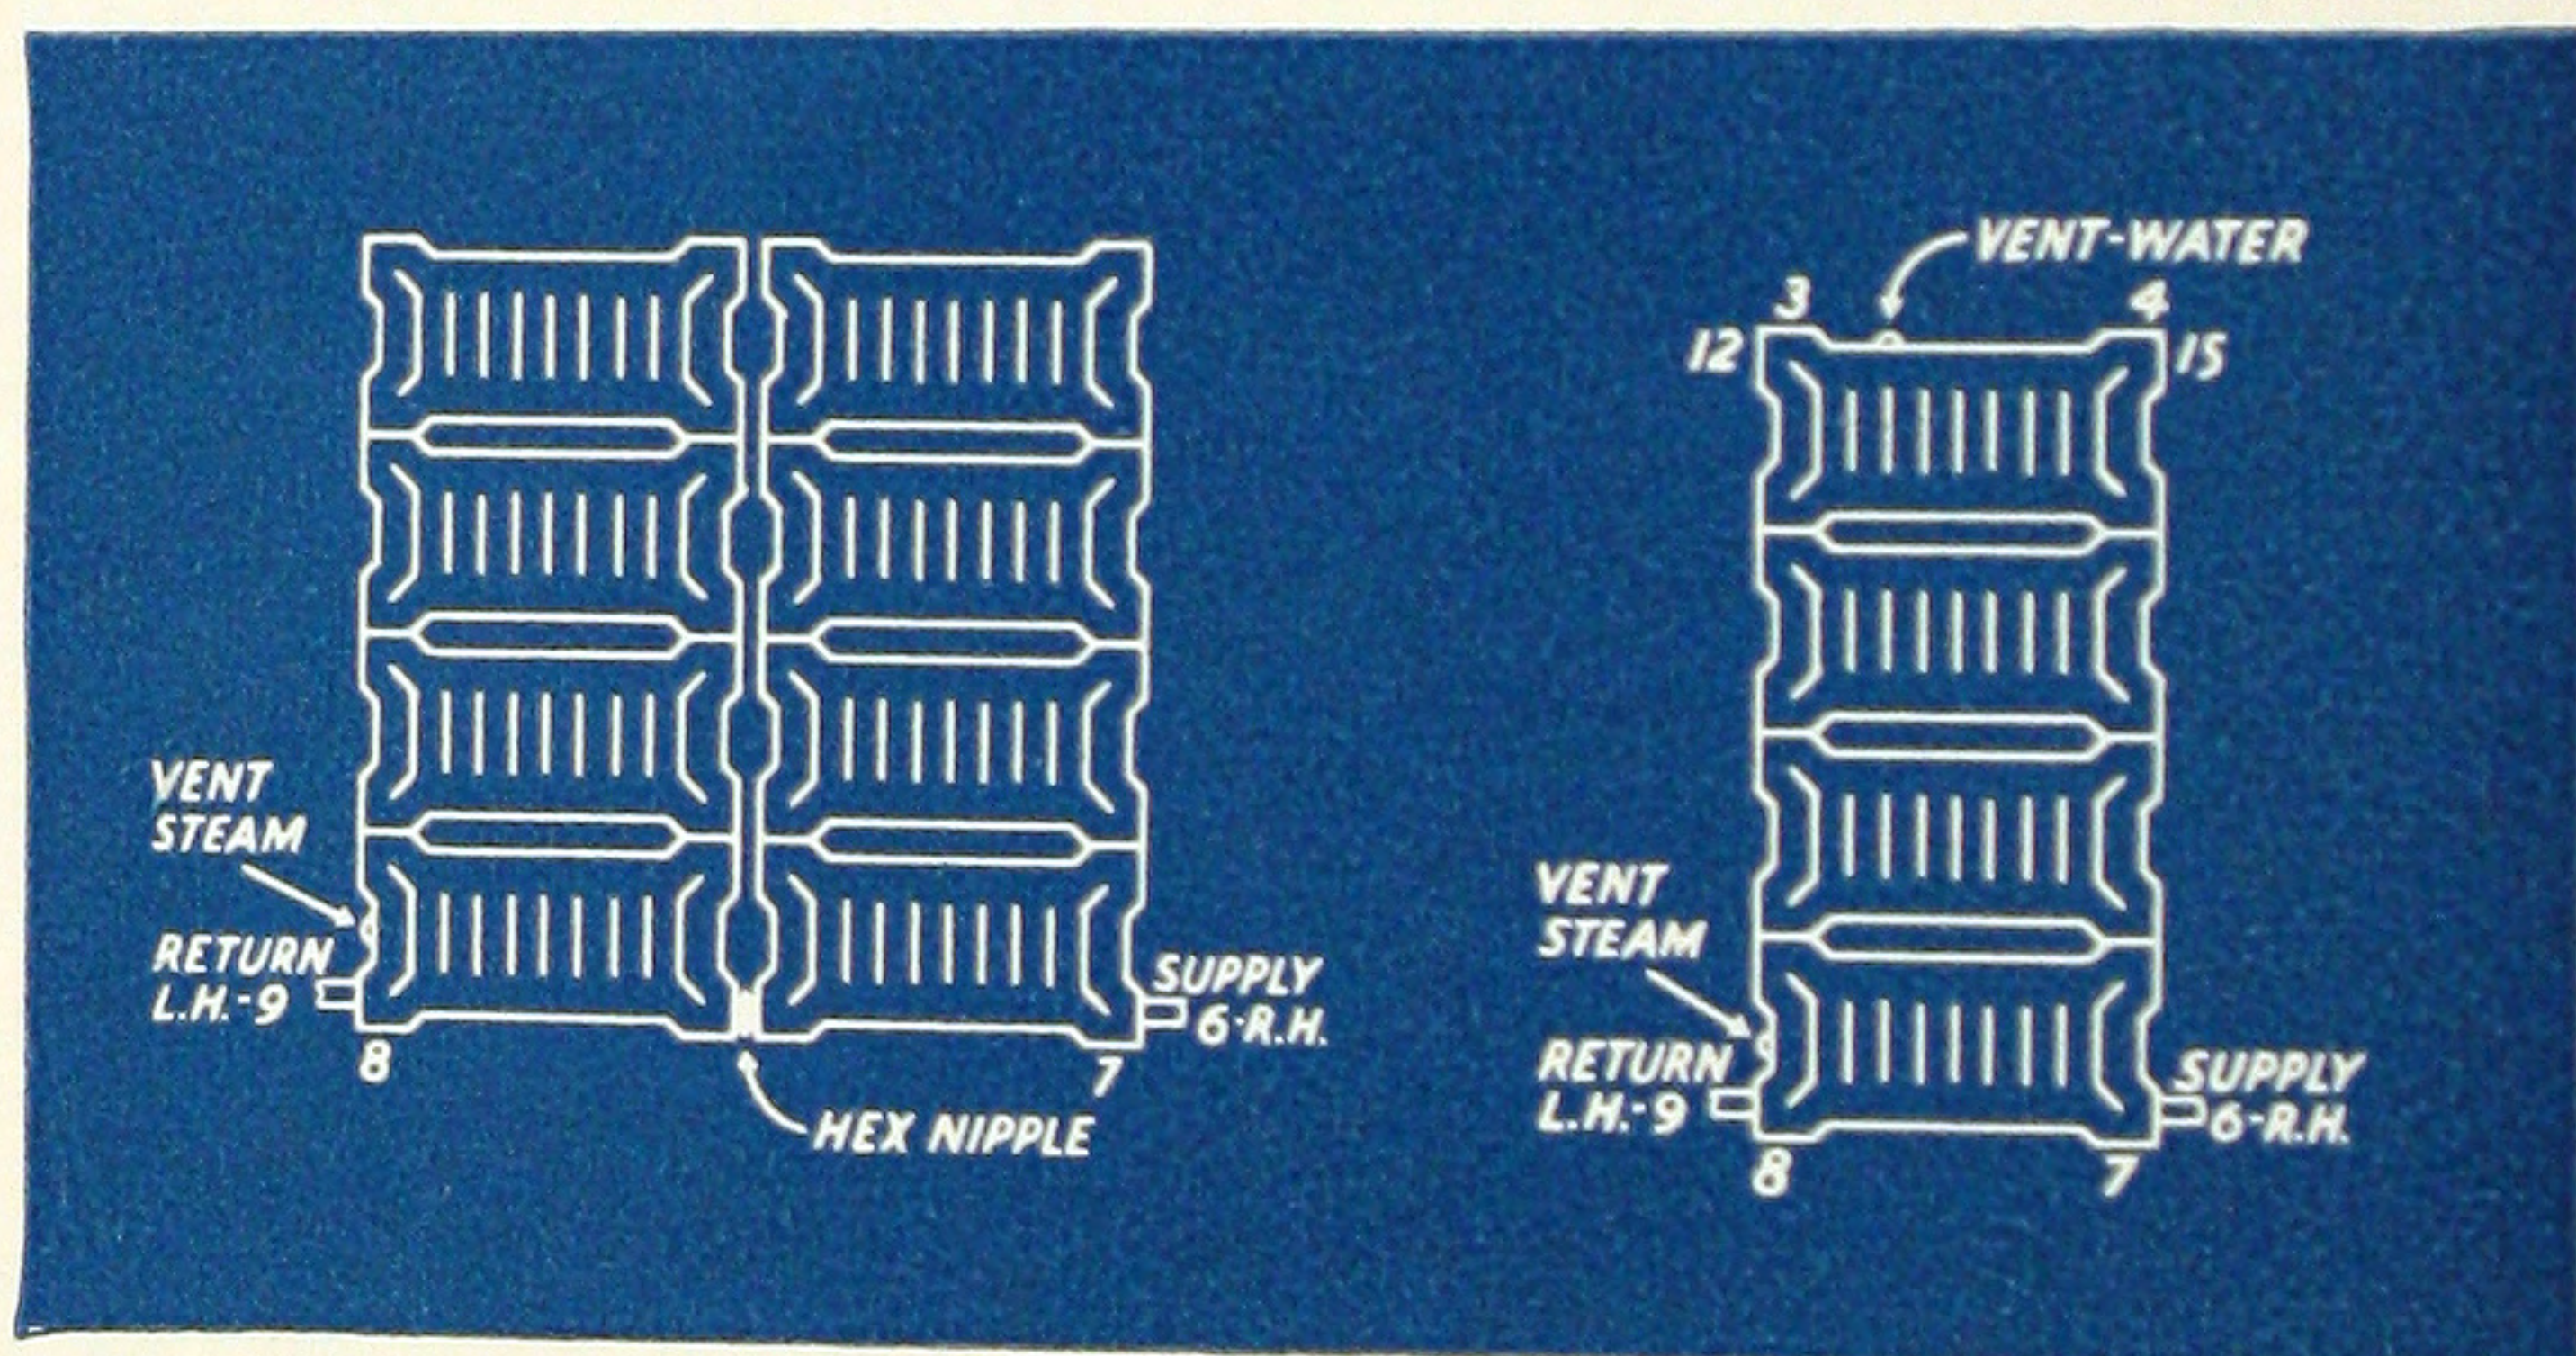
Assembled in two or more stacks. One and two pipe steam only. Bottom feed.
